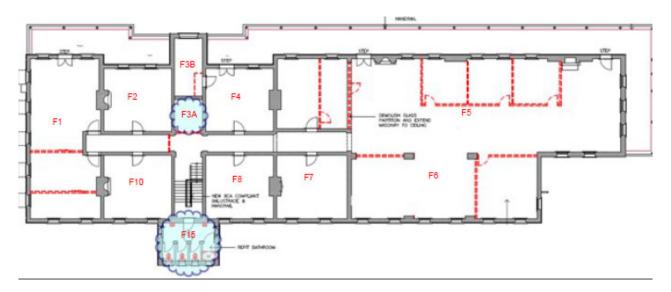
First floor existing amenities identified & clouded in Blue - Room F3A and F15 on mezzanine level.
